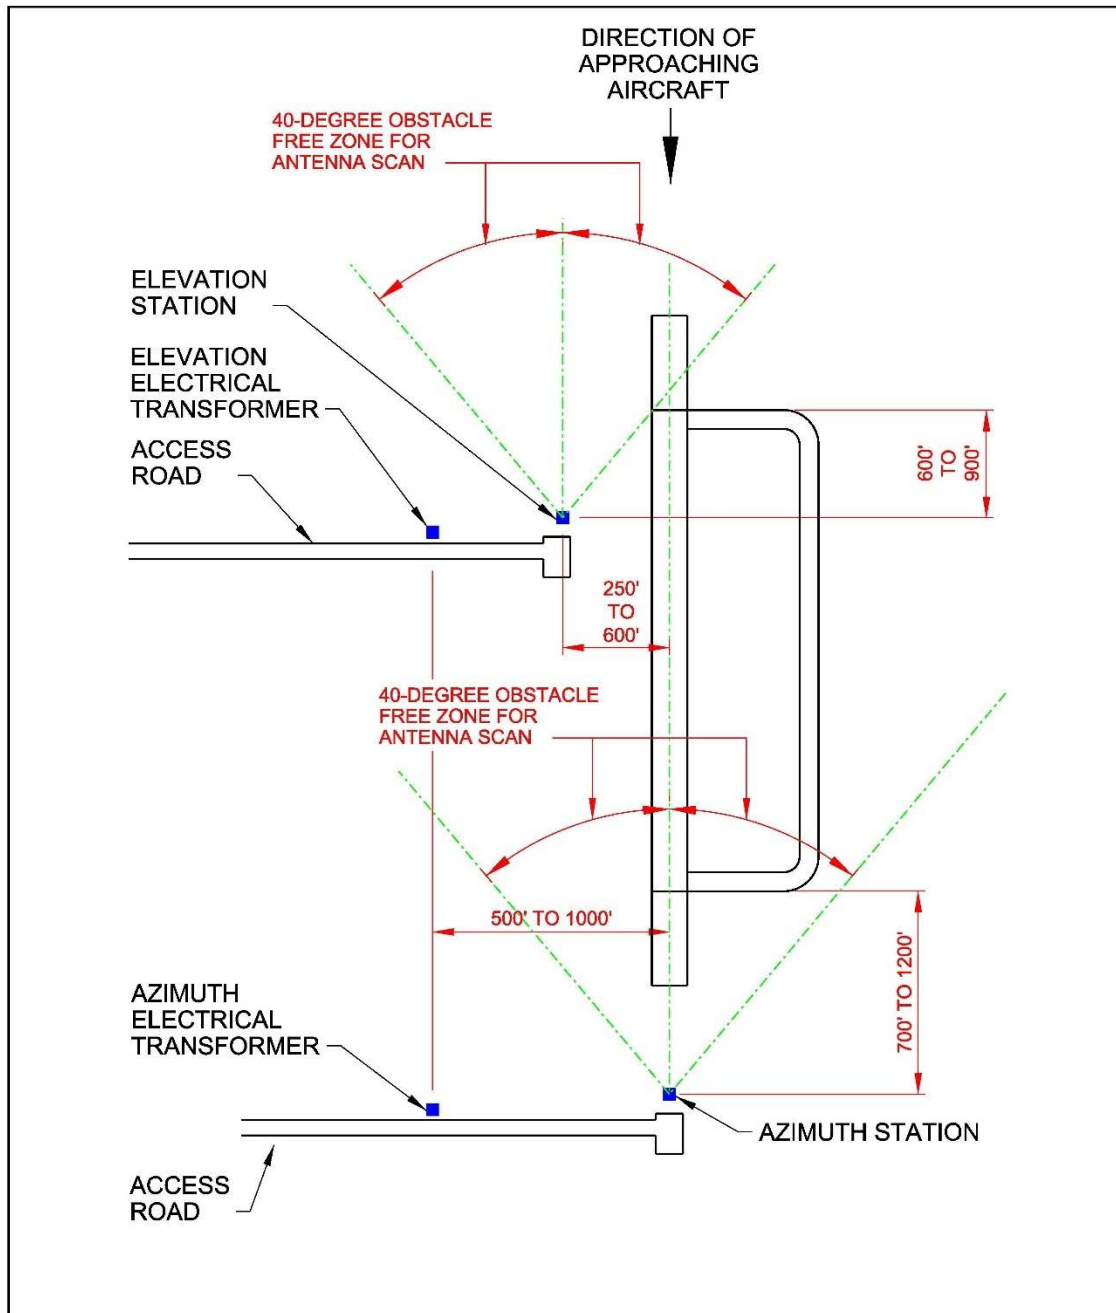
MLS Facility: Azimuth Station Site Plan
